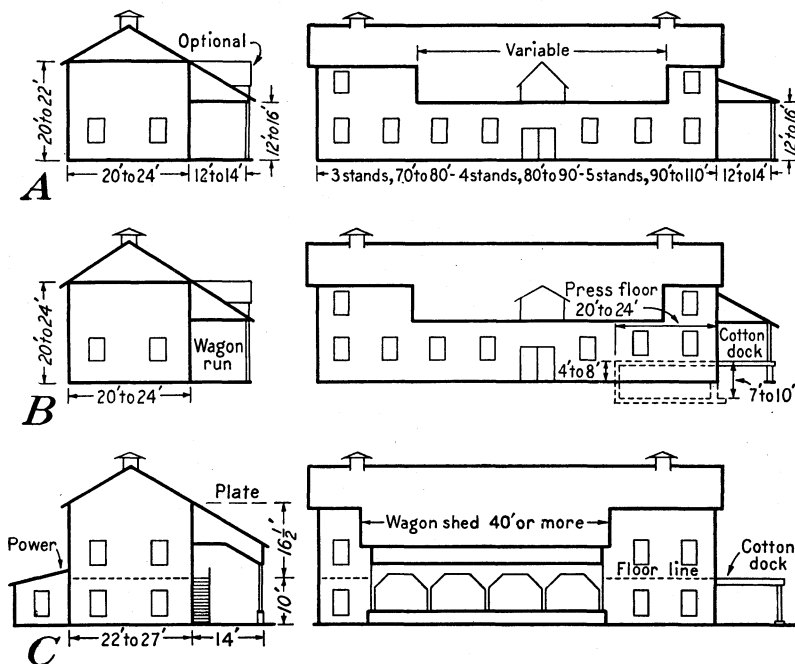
Dimensions of modern gin buildings for single outfits: A, One-story gin; B, one-and-one-half story gin; C, two-story gin.
